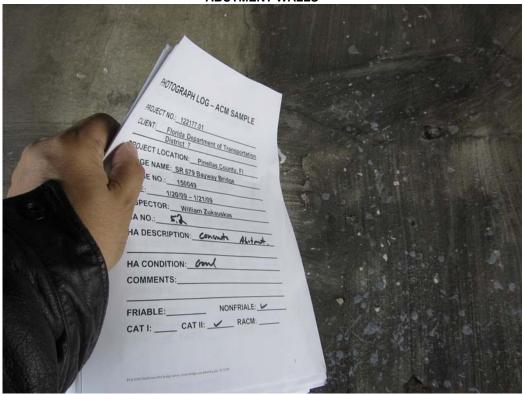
01/21/09 – SAMPLE 5.2 – HA 5 CONCRETE ABUTMENT WALLS
